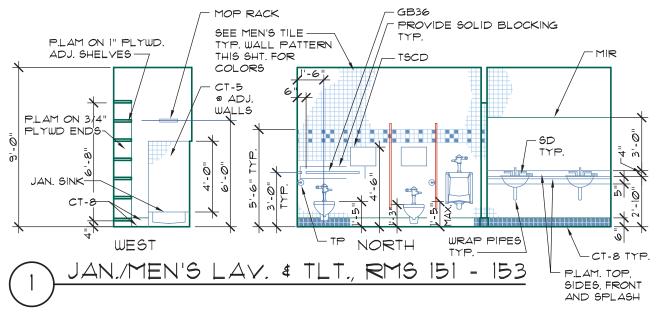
Cabinet drawings and interior elevations are drawn by the architectural team. Courtesy Goodwill Industries of the Columbia Willmette/Michael & Kuhns Architects, P.C.
